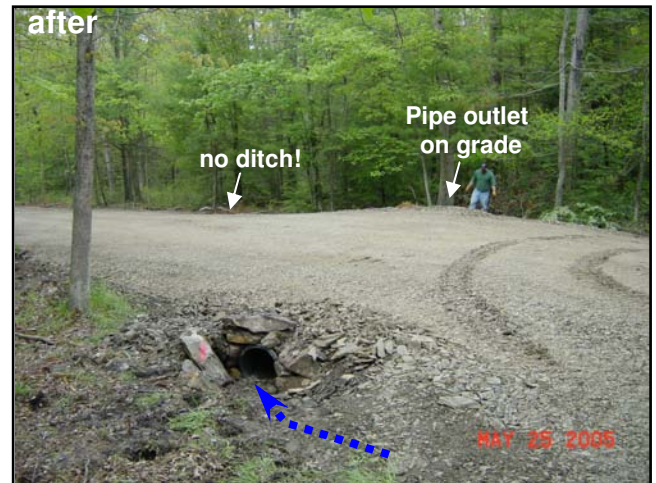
One of two new crosspipes installed. Notice the grade-break in the road over the pipe to get water off the road.
